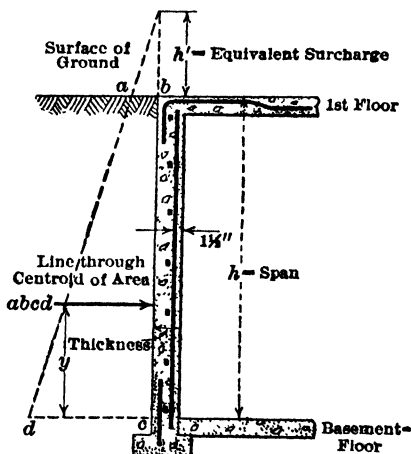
Diagram of Basement Wall Subjected to Earth Pressure and Surcharge
